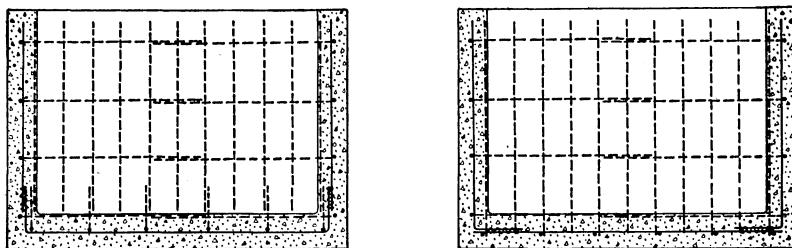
Use of L-shaped and U-shaped rods in locating splices
